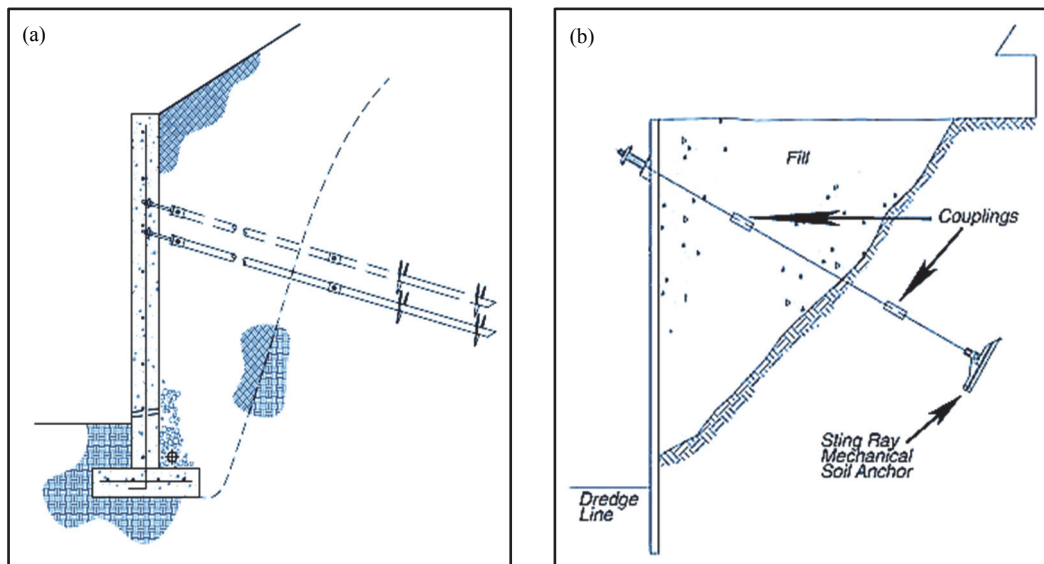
The use of mechanical anchors in top-down retaining wall construction: (a) helical anchor (Perko 2009); (b) directly embedded plate anchor
